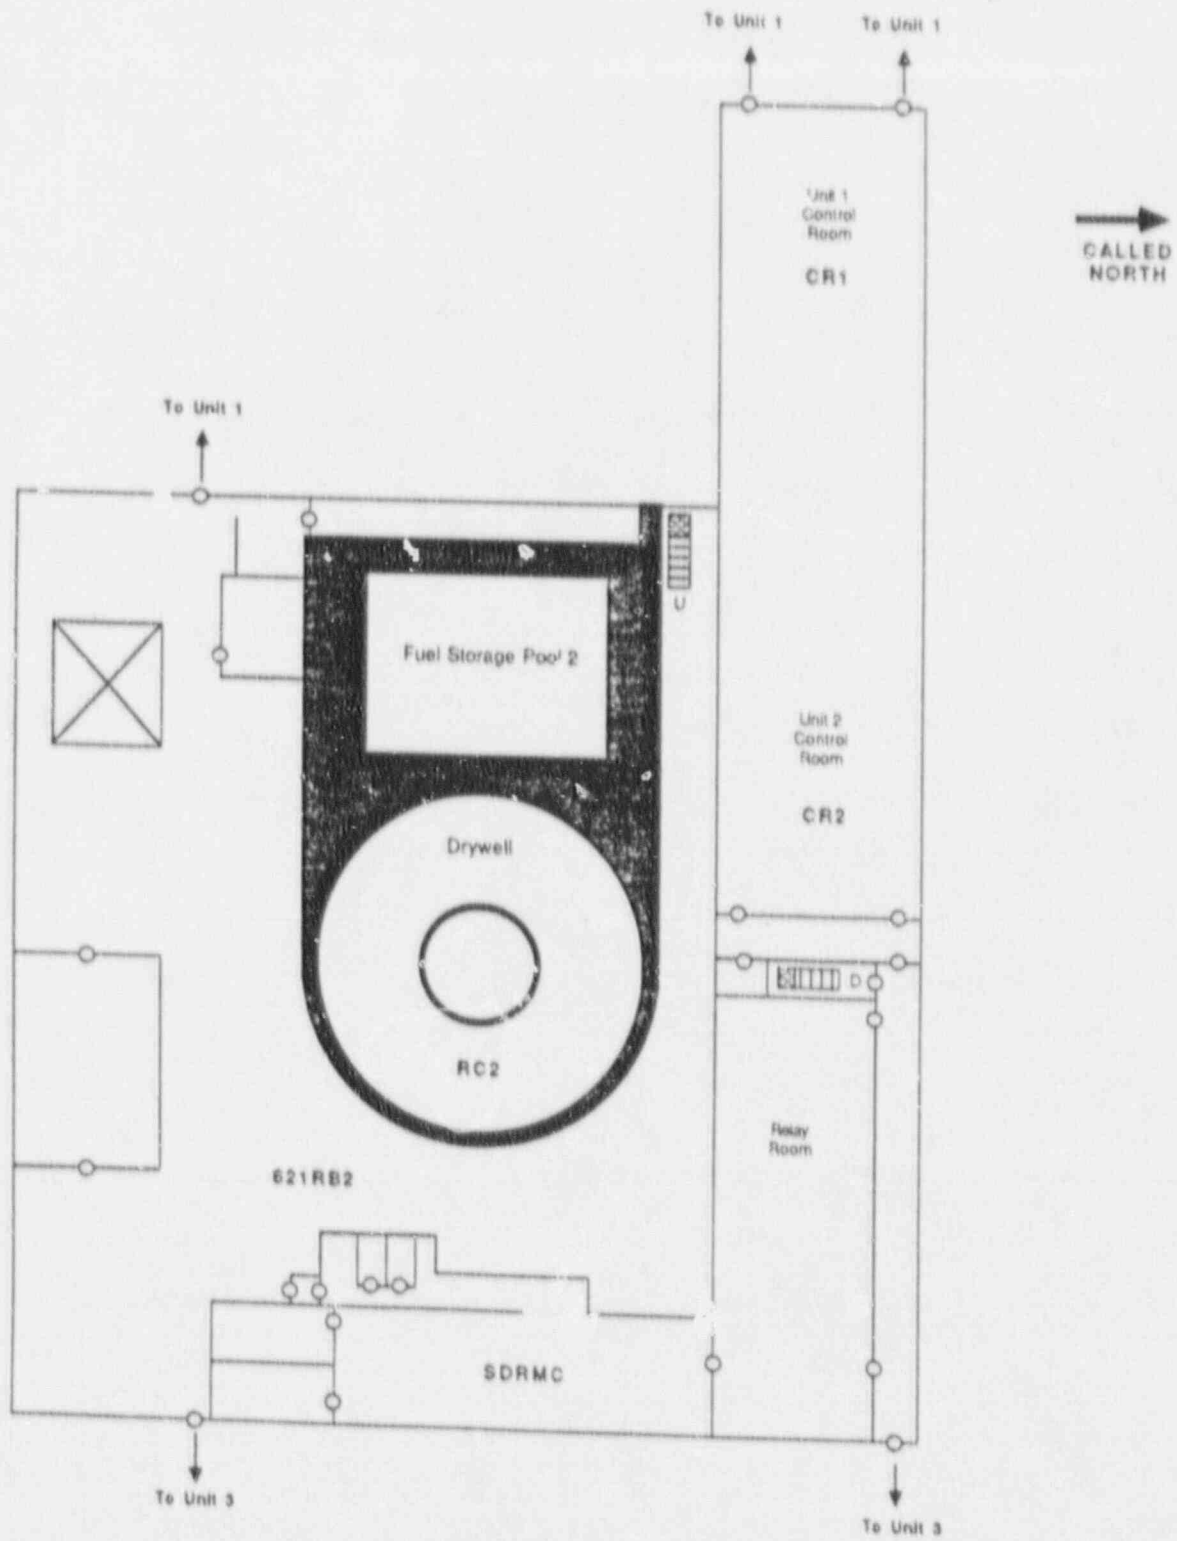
Browns Ferry Unit 2 Reactor Building - 617 and 621.5 ft. Elevations.
